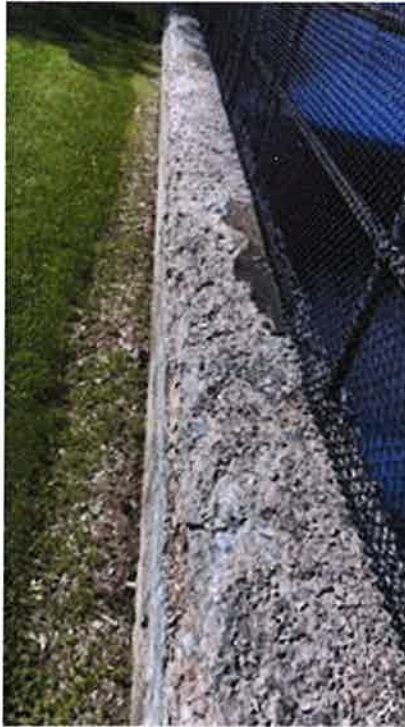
Spalling on top of the spillway's right downstream abutment wall
